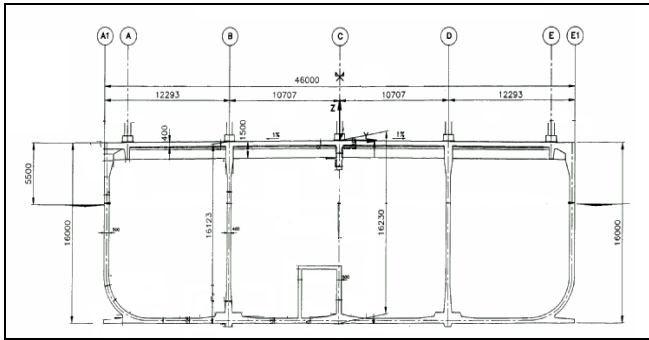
Midship Section of the N'KOSSA concrete FPU
